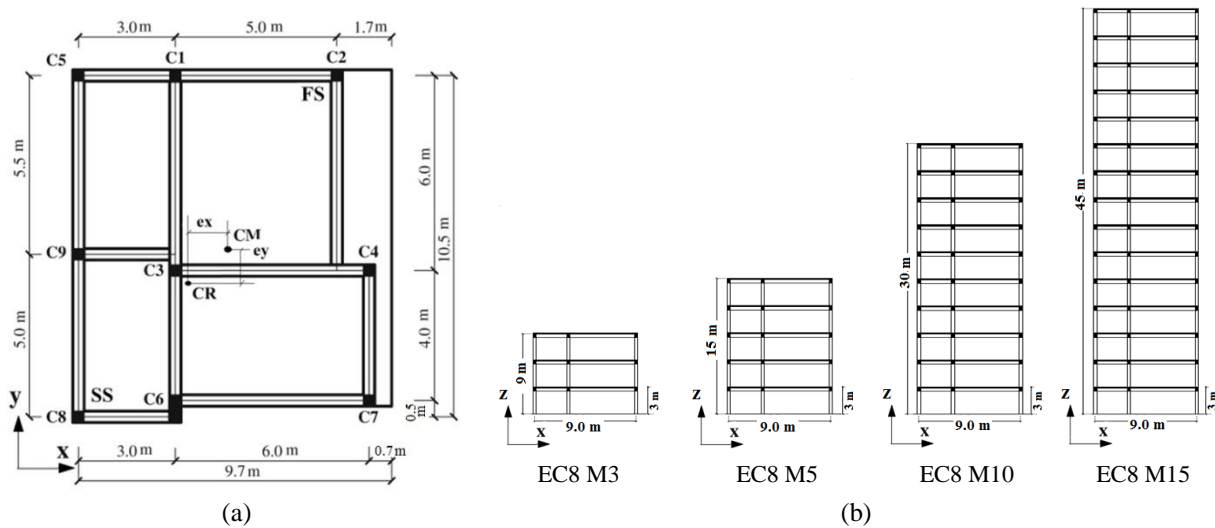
Irregular RC buildings (a) plan (Negro et al., 2004) and (b) elevation (all dimensions are in metres).
